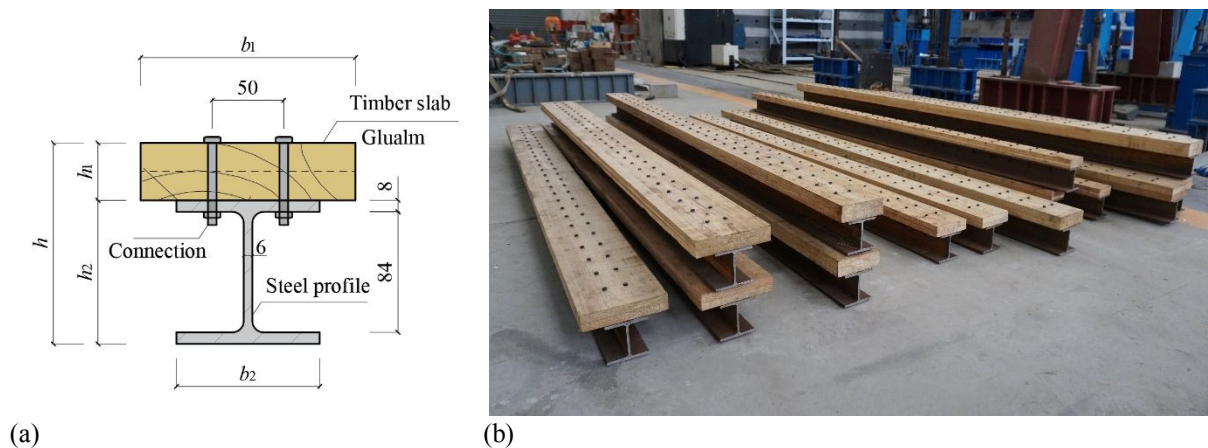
Configuration of specimens used in test (all dimensions are in mm): (a) sectional dimensions, (b) perspective view.
